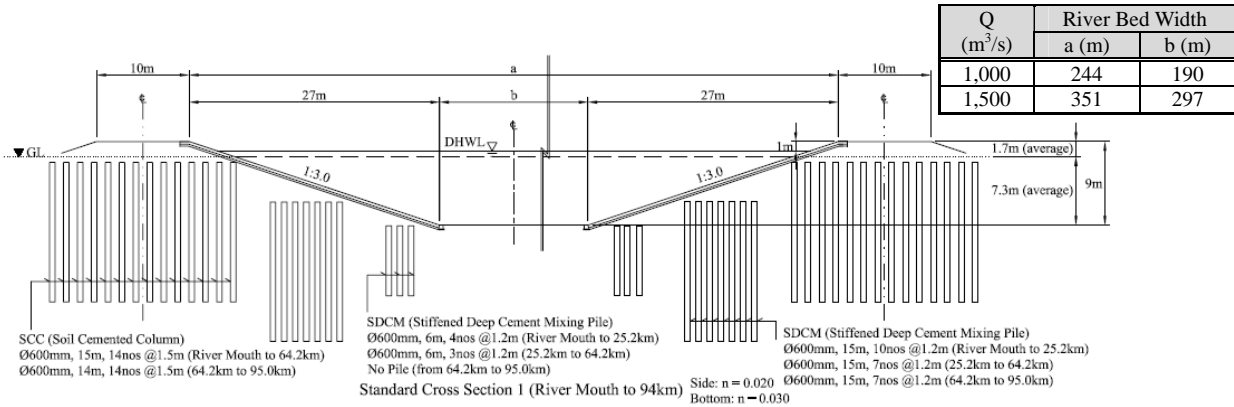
Standard Cross Section of East Diversion Channel with Slope Protection (0km to 94km)
